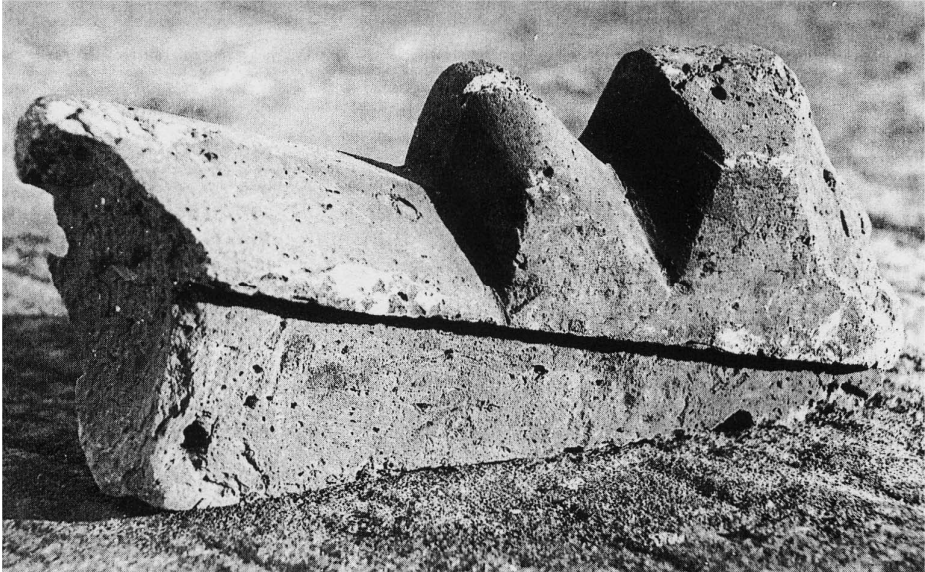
A finely finished 'crocket' at Wallington Hall (Norfolk) (c.1525)
